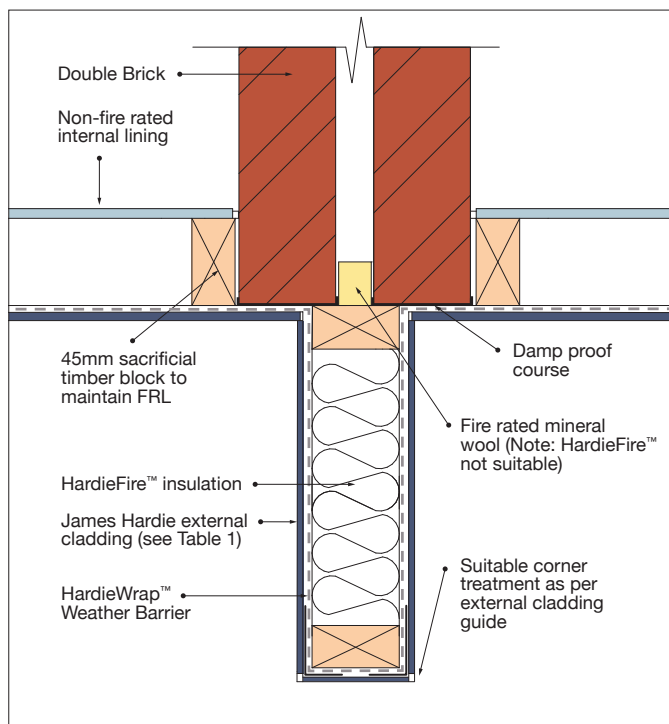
HARDIESMART™ BLADE WALL JUNCTION WITH BRICK/MASONRY COMMON WALL SYSTEM
